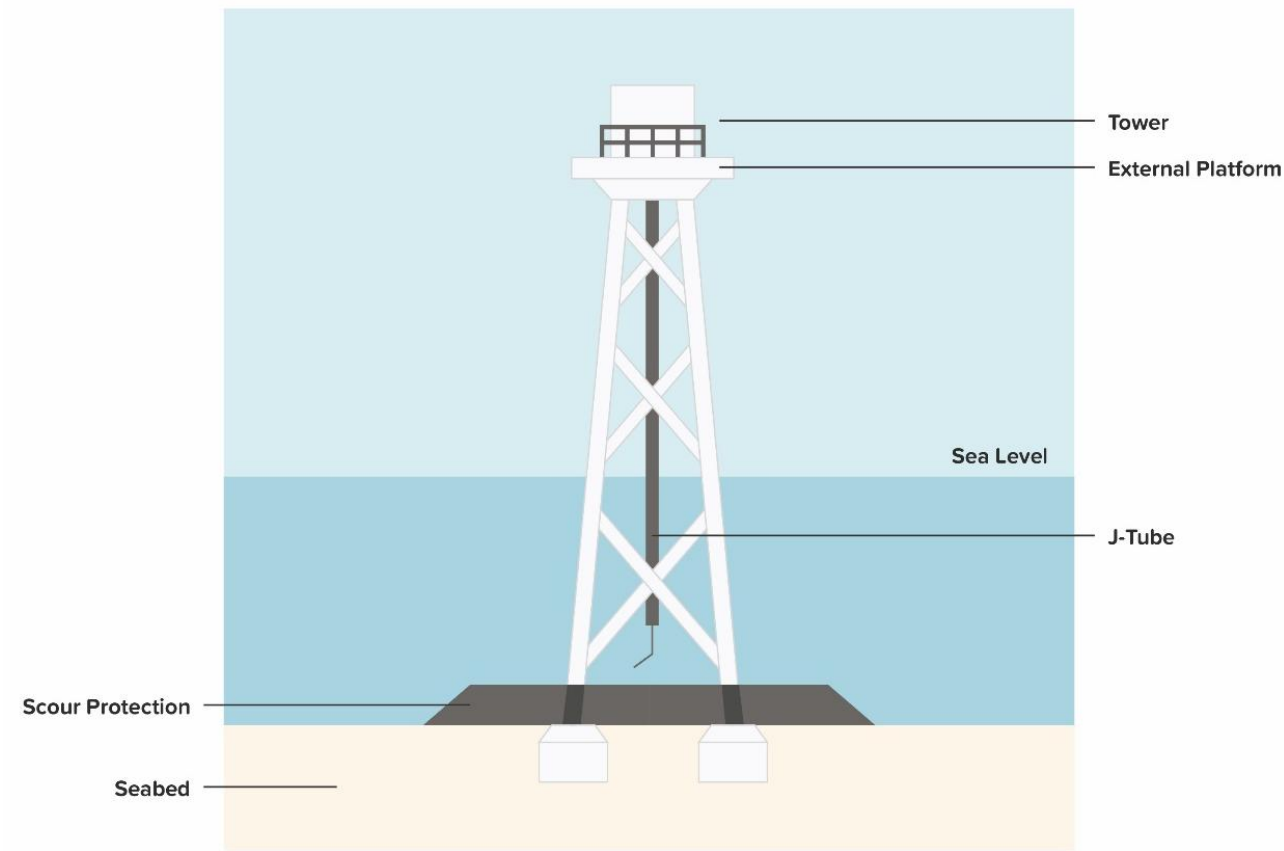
Indicative Suction Bucket Foundation Schematic
